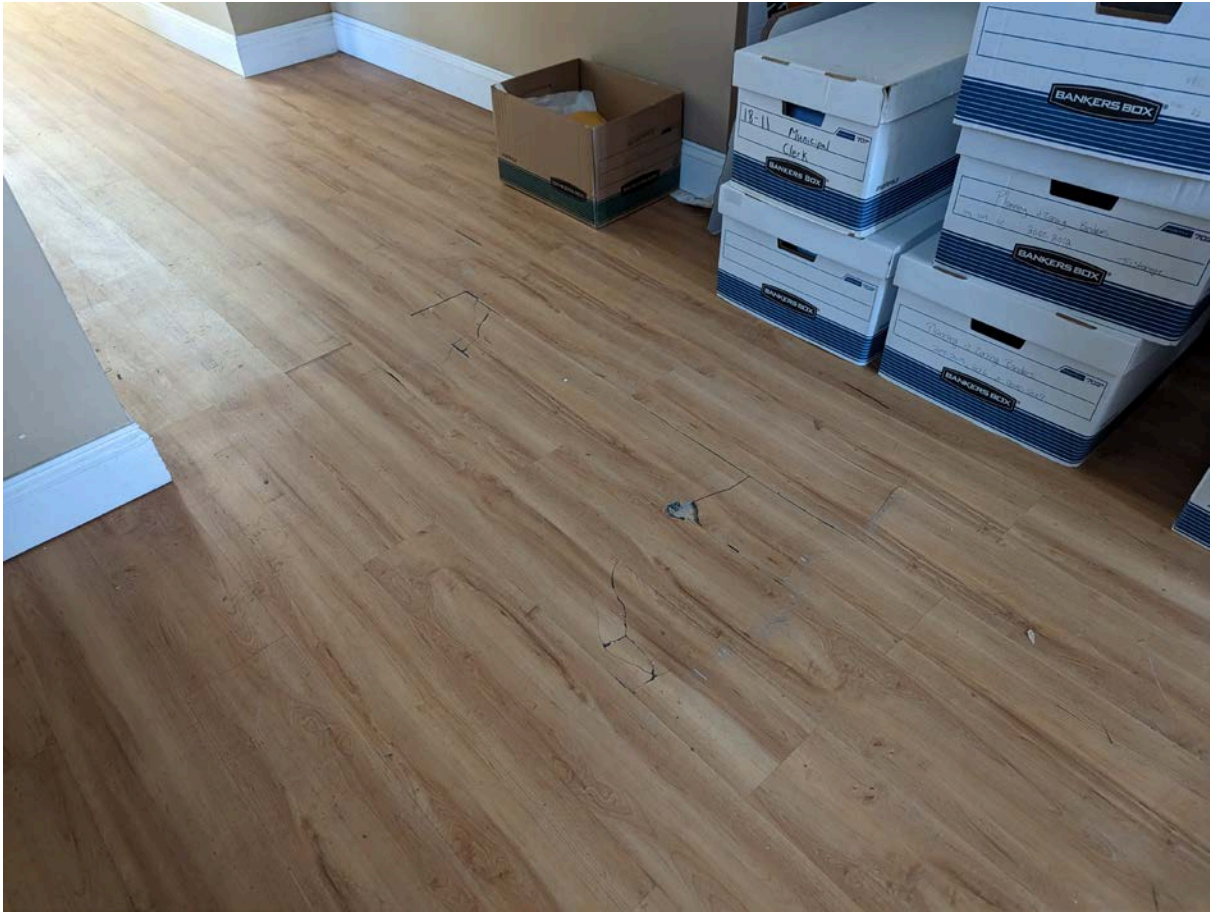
Damage to First Floor Finish – Sleepers over Slab on Grade.
